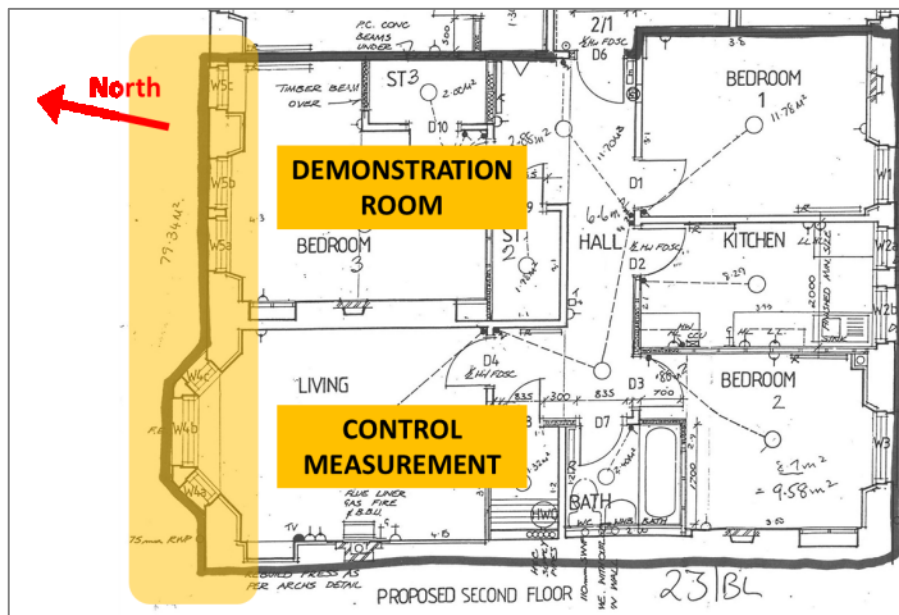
FLOOR PLAN OF CASE STUDY FLAT: SENSORS INSTALLED ON THE NORTH-FACING EXTERNAL WALL (LIGHT YELLOW SHADING) IN A DEMONSTRATION AND CONTROL ROOM (IMAGE COURTESY OF HISTORIC ENVIRONMENT SCOTLAND)
